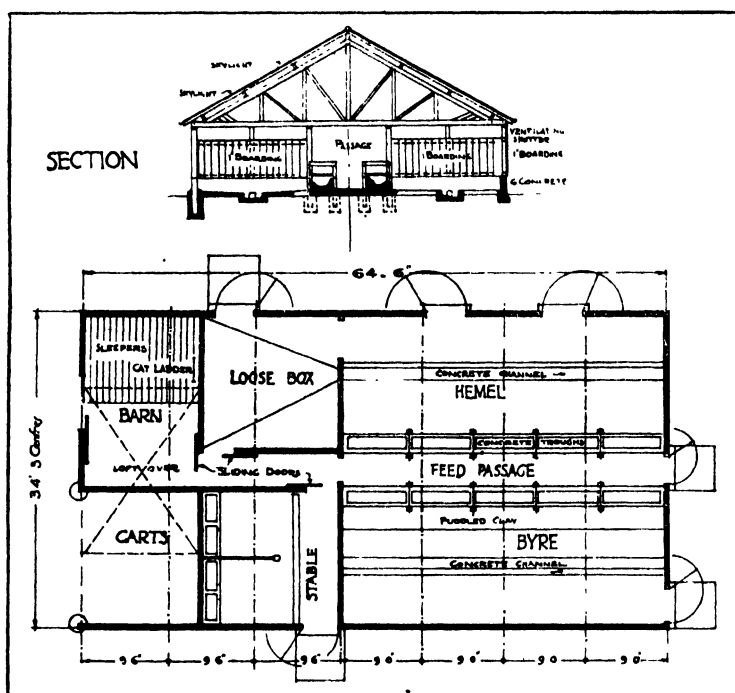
Plan and Section of Farm Building at Hexhamshire, Northumberland.
